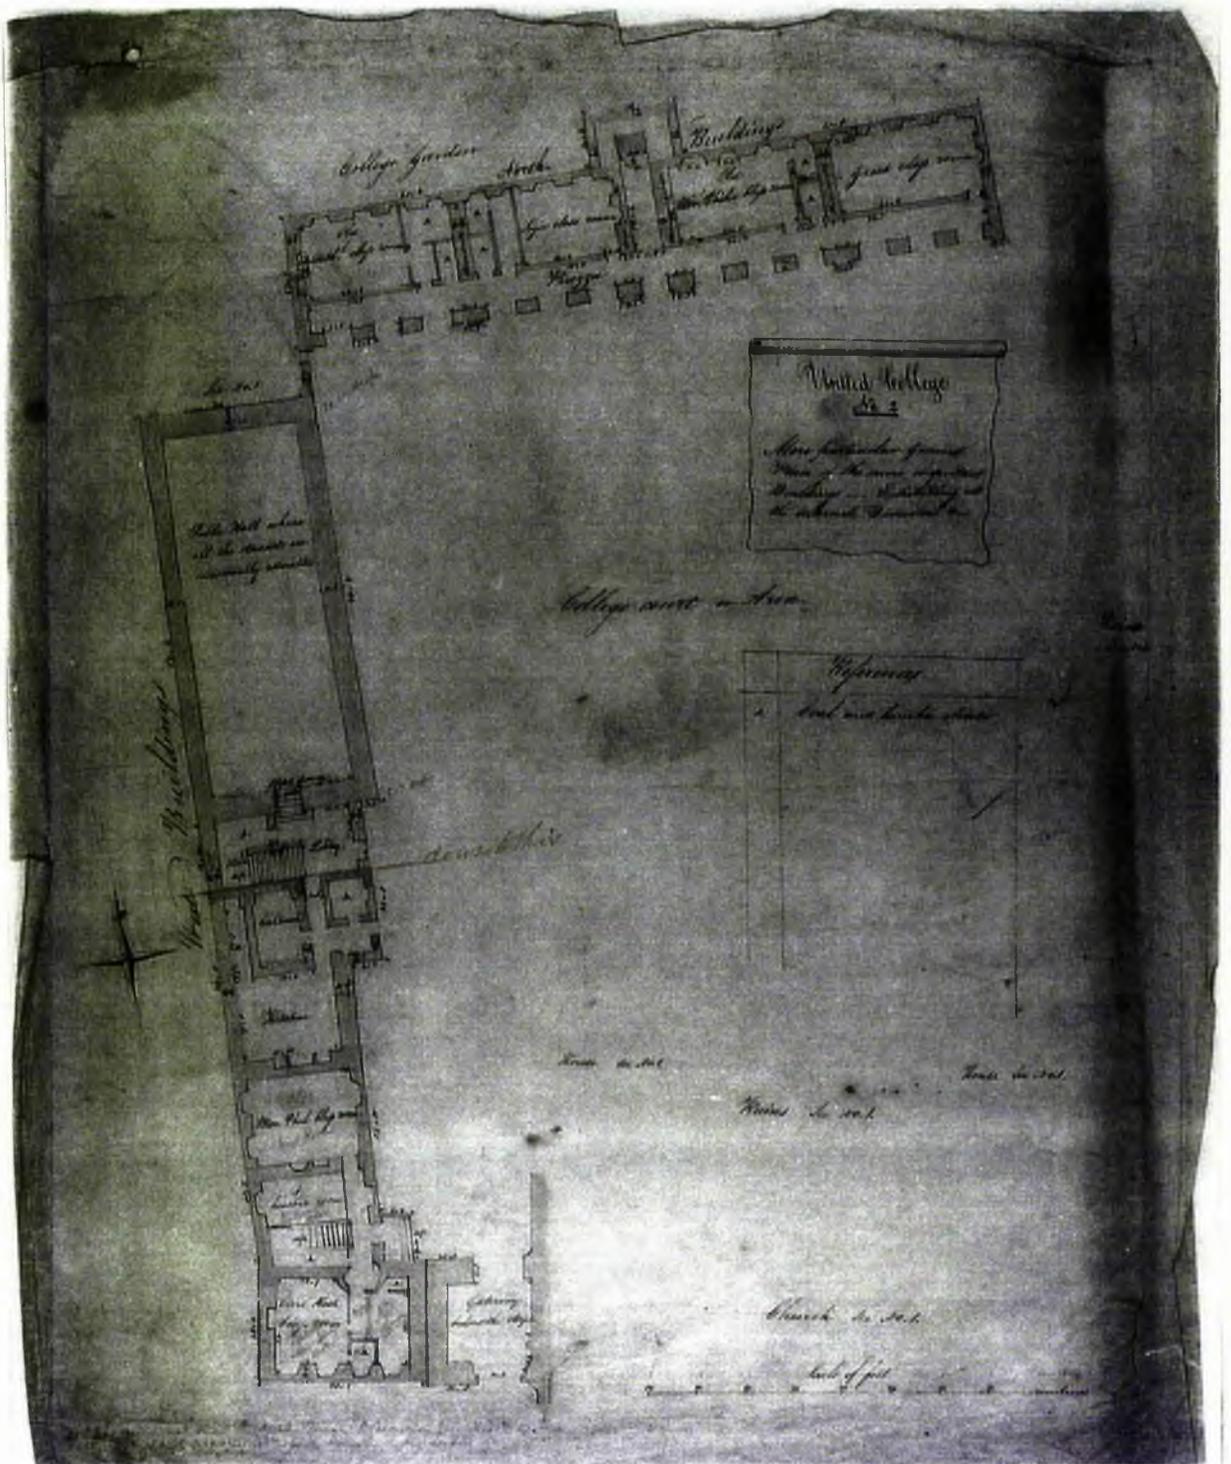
United College. Ground floor plan of west and north buildings, survey drawing No.2. R. Reid, probably drawn in 1825.
